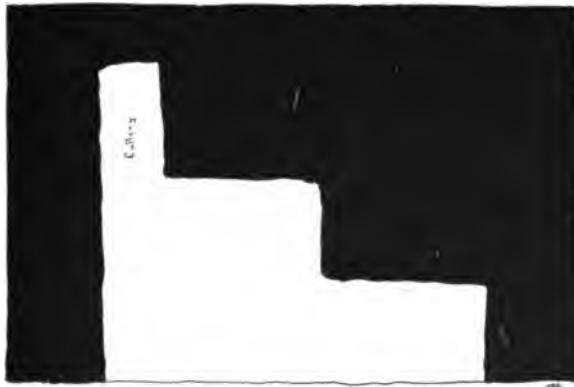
Horizontal Plan, showing Method of Opening Entry by "Cutting."
